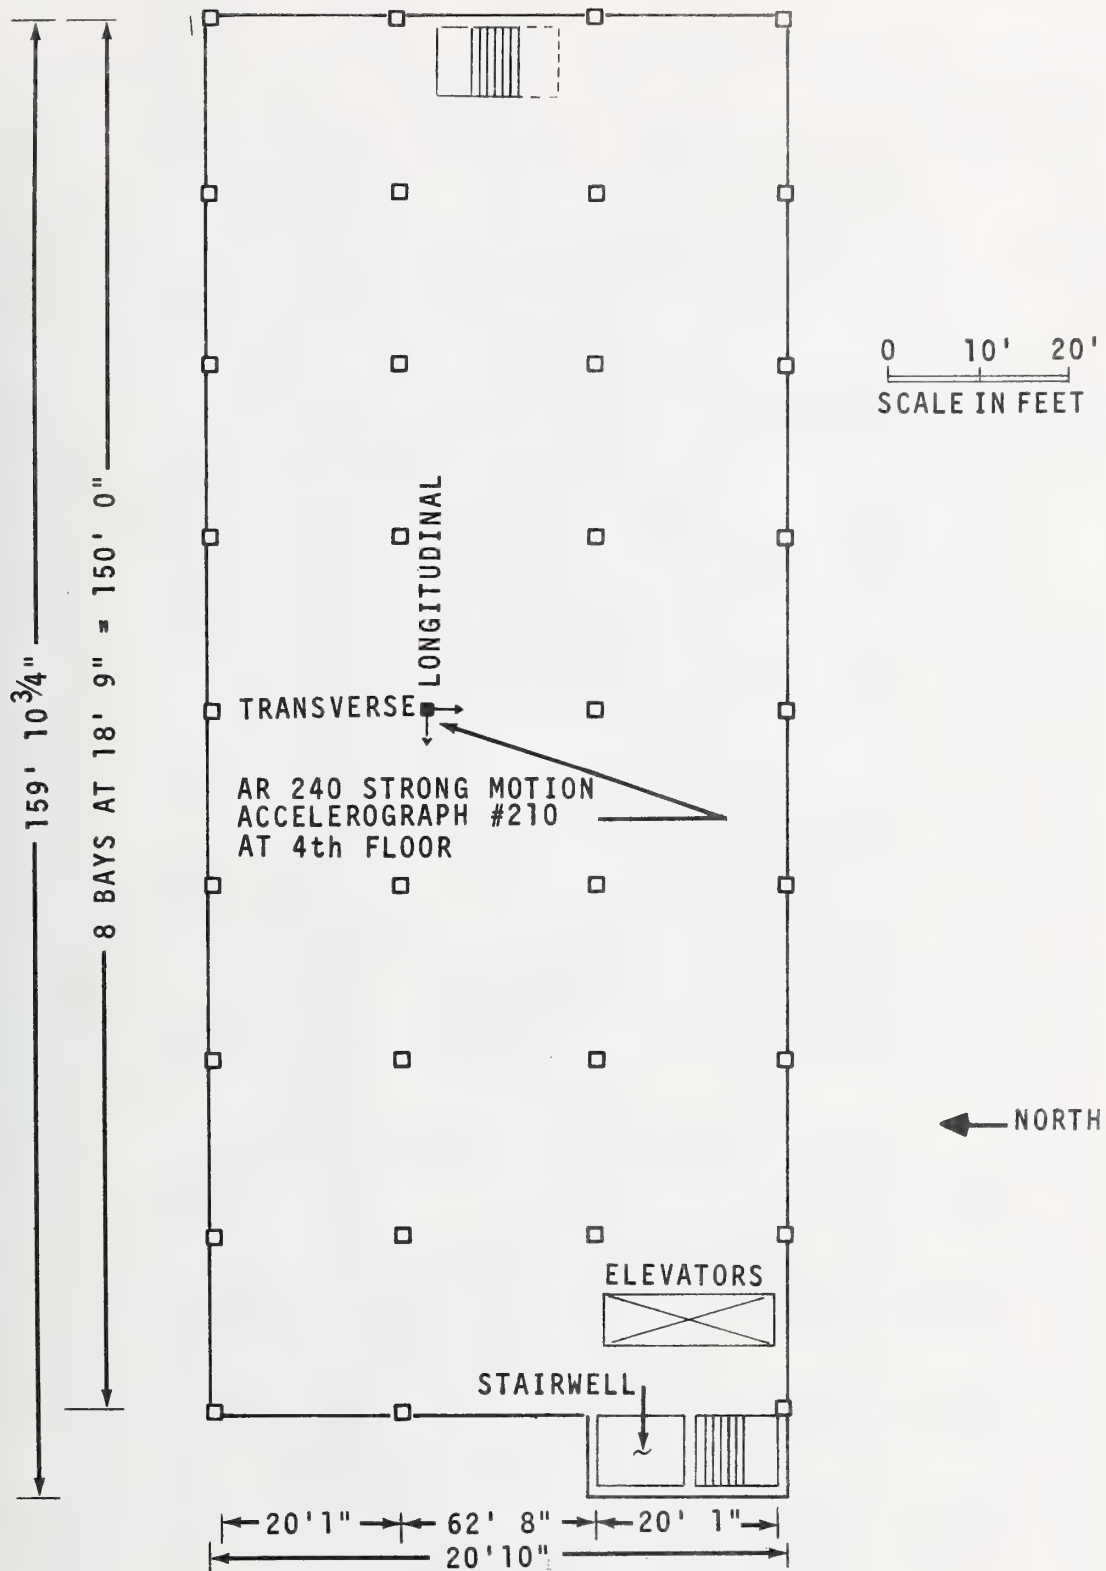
Typical Floor Framing Plan -- Building No. 29
